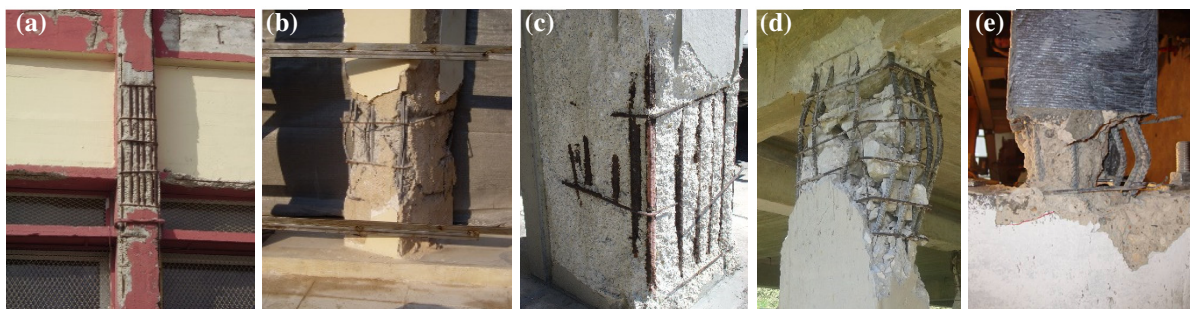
(a)-(c) Reinforcement detailing of RC columns built before the 1970's in South Europe; (d) Failure due to reinforcement buckling; (e) Buckling of longitudinal reinforcement in FRP-jacketed RC columns (source: personal files).
